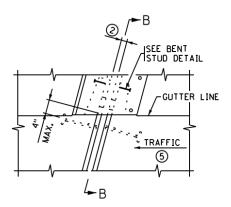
MnDOT plan of strip seal joint at curb-pavement interface
